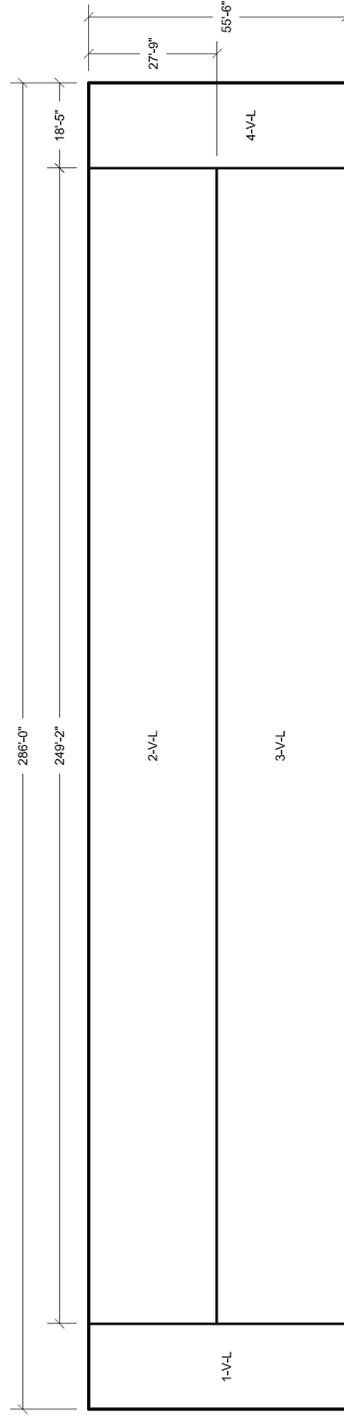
H.6-111: COOLING TOWER NORTH (AND SOUTH) WALL LOOKING SOUTH (NORTH),
